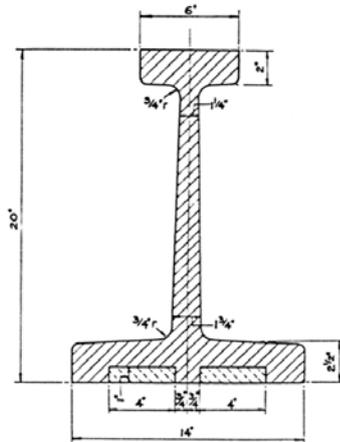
Wrought-reinforced cast-iron girder for the Reading and Reigate Railway with 7.6 m (25 ft) span, Peter W. Barlow, c.1840s. (Sutherland²)
